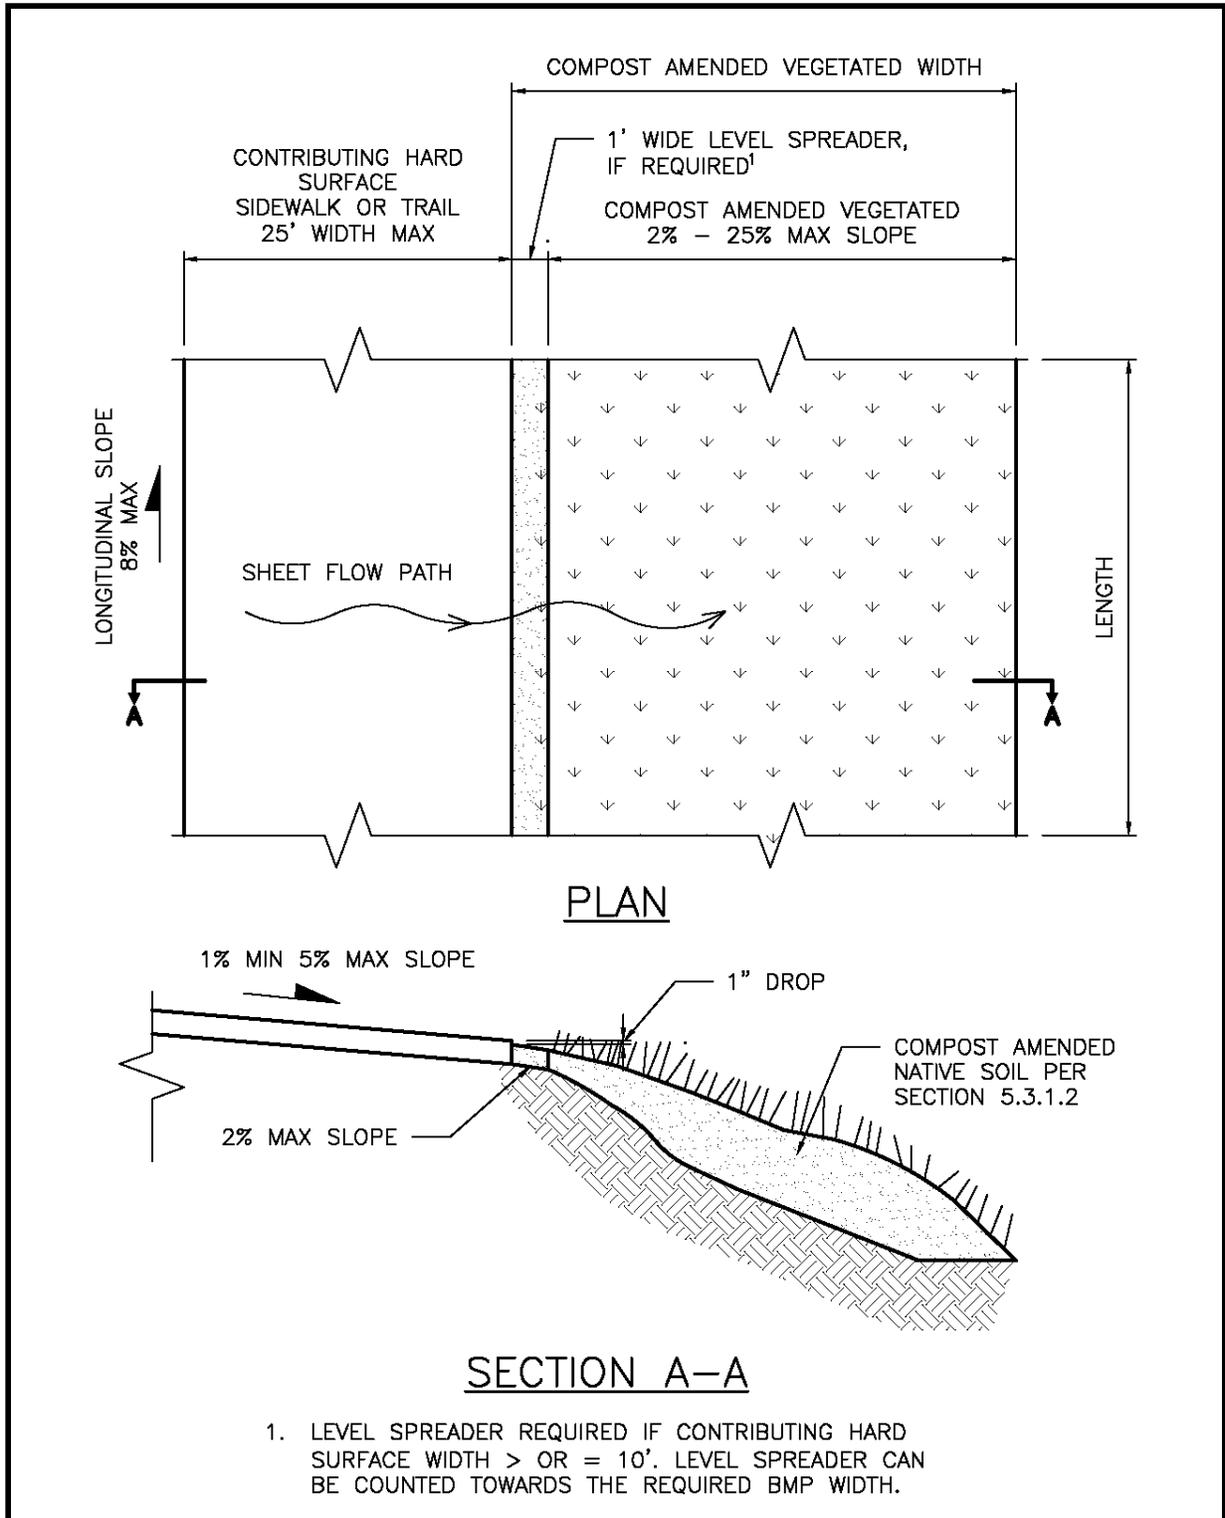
Typical Sidewalk/Trail Compost-Amended Strip BMP.
